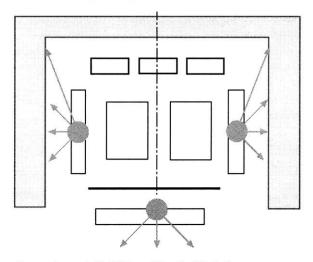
Carol Markkula's Ideal Drawing of Primary Care Unit. 1
